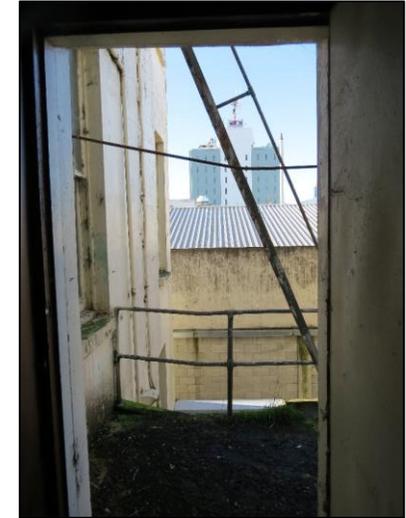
Building exterior, south wall of Room 31 taken over fire escape (Room 33) on first floor, facing east
